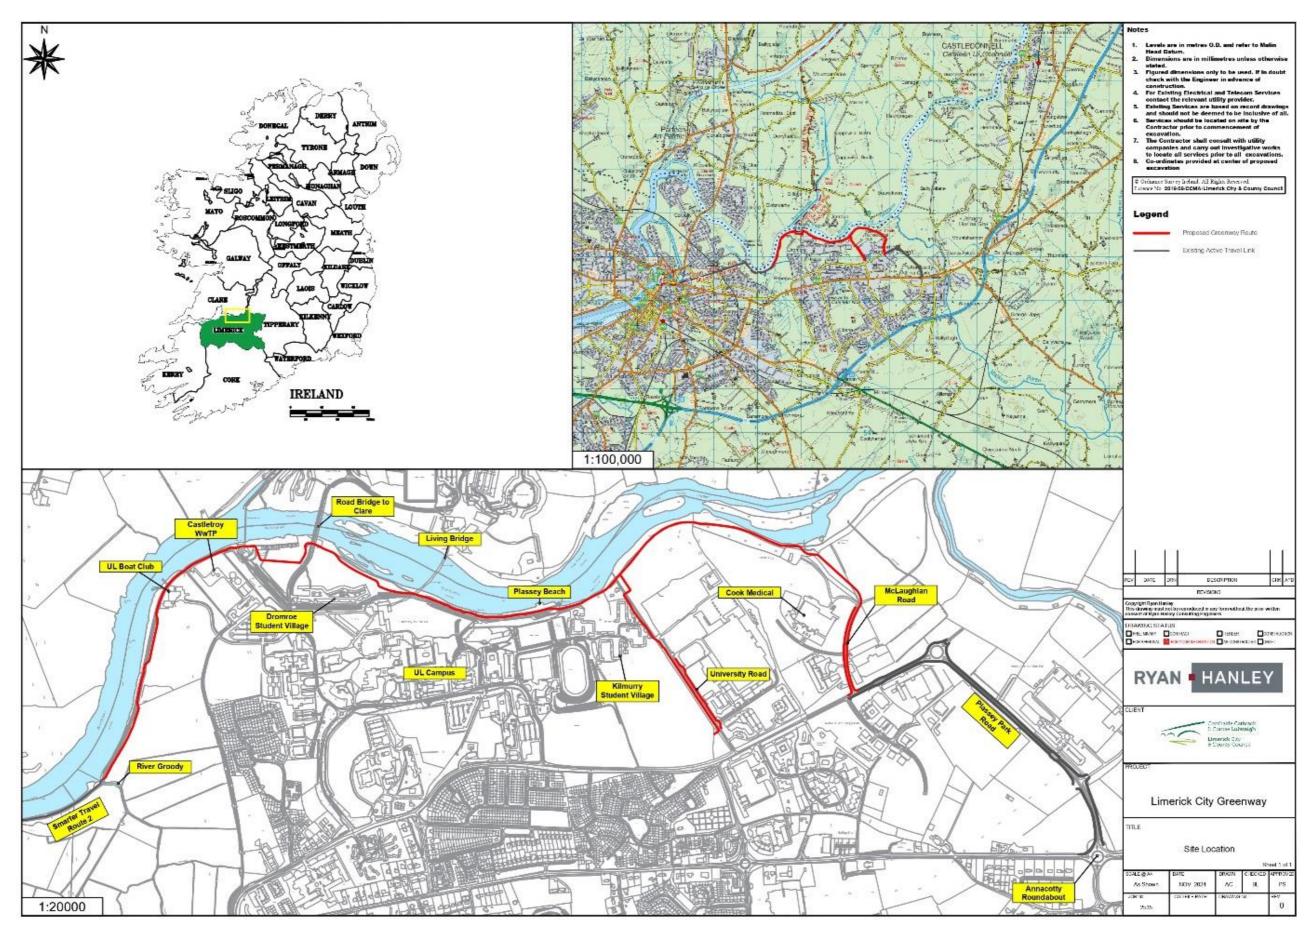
LOCATION OF PROPOSED WORKS
